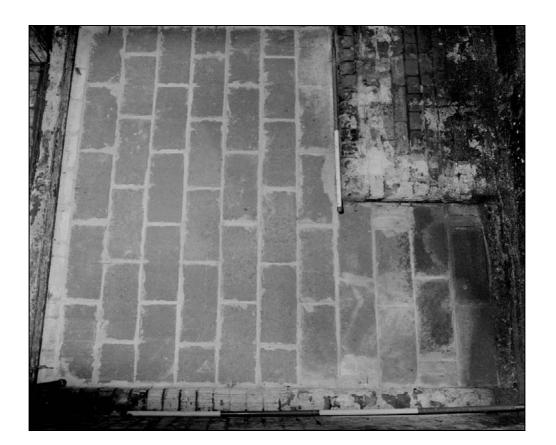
General view of G3, west range extension – note inserted staircase (film 13.9)
